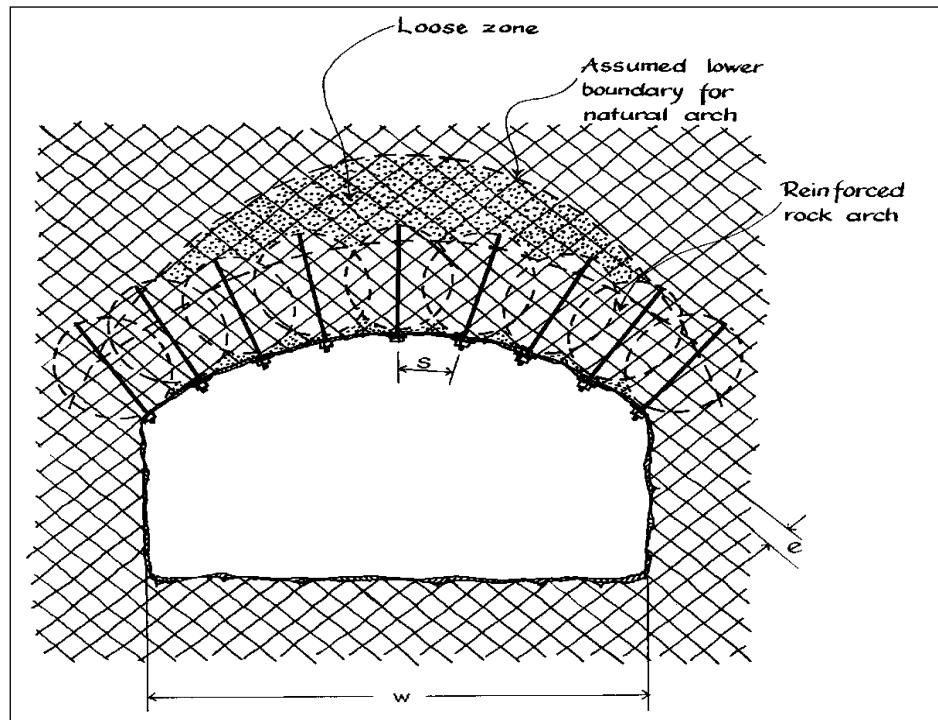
Rock bolting pattern for an excavation in jointed rock (after Stillborg 1994)
